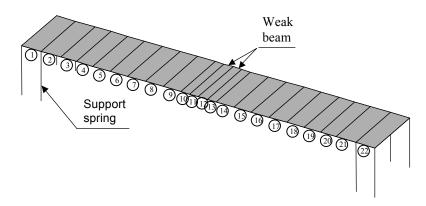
A damaged bridge FE model with 'weak' beam elements
